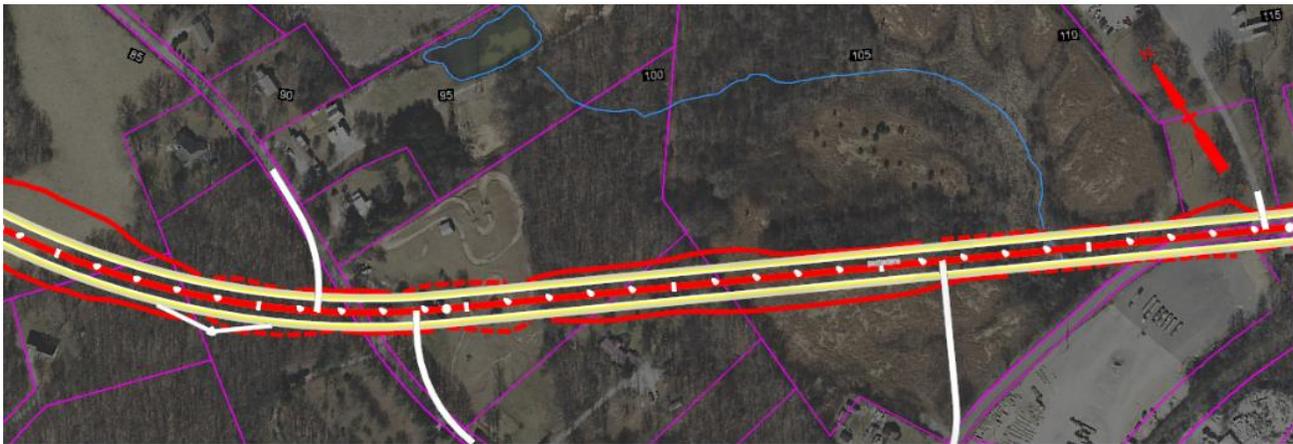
Alternative A1, Section 3 Intersections with Hyder Ridge Road & E 1st Street
